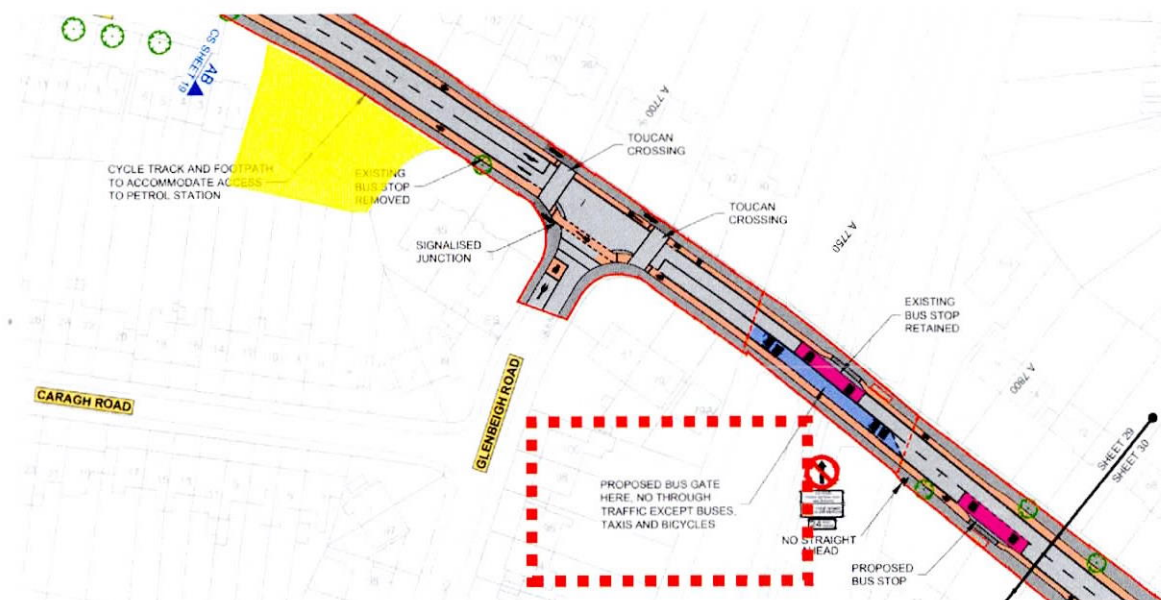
Extract from Sheet 29 of the General Arrangement drawing illustrating the proposed bus gate (red dashed line) relative to our client's site (yellow fill).
